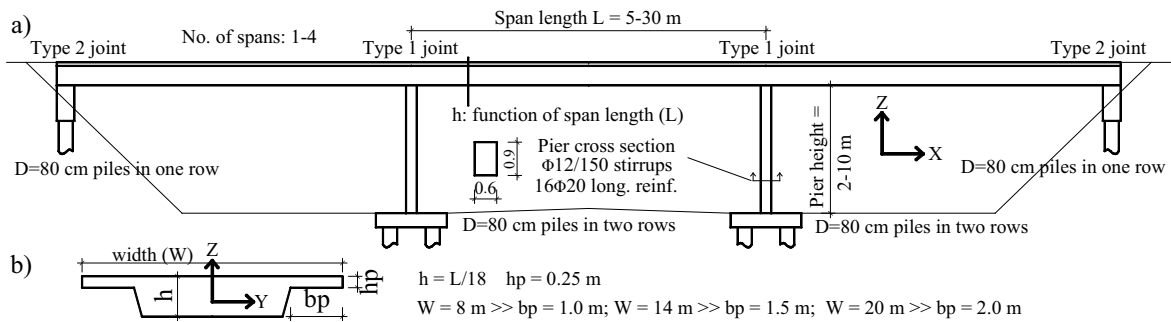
General layout of SLAB bridges: a) side-view of the bridge; b) general cross-section.
